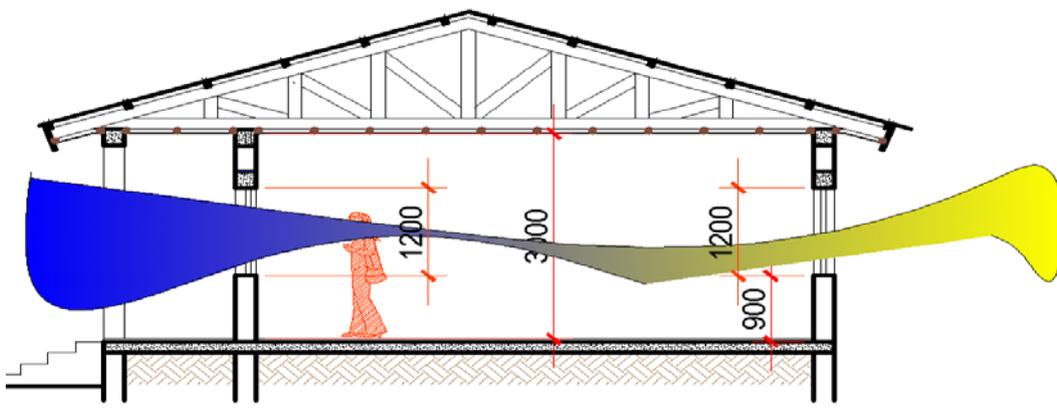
The positioning of windows on two opposite walls in the classrooms surveyed. Source. Fieldwork by author (2017)
